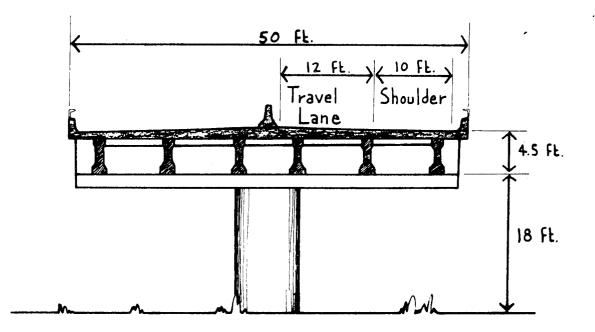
Typical Elevated Cross-Section, Wide Guideway for Buses and Carpools
